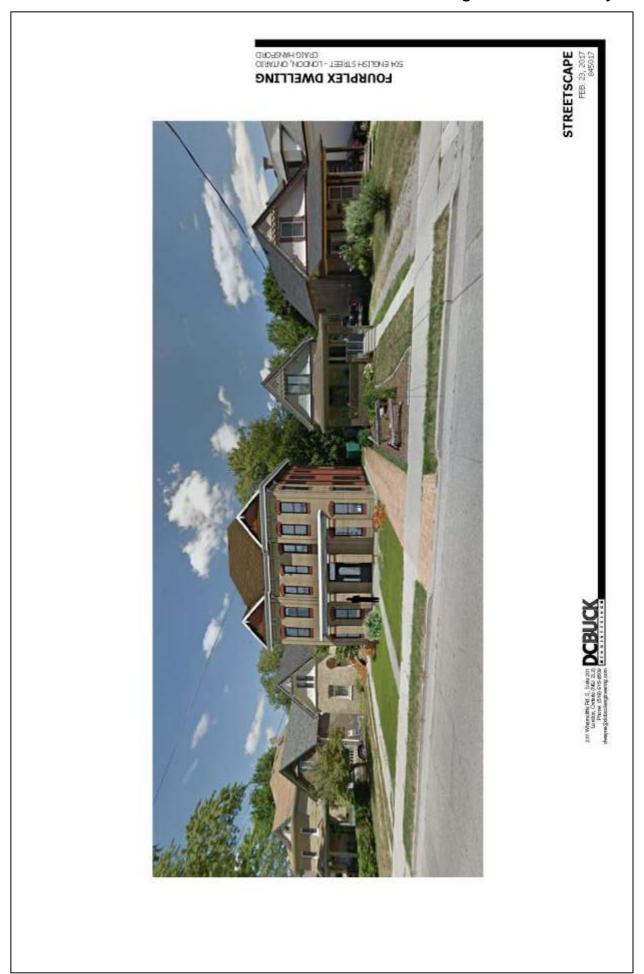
Streetscape perspective showing proposed building on the east side of English Street. Note: setback of proposed building negotiates the difference in setback between the buildings located at 506 English Street and 494 English Street.
